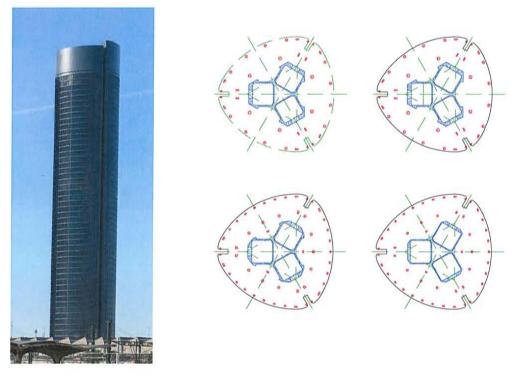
Torre Sacyr Vallehermoso with typical floor plan of basement, low-, mid- and high-rise section
